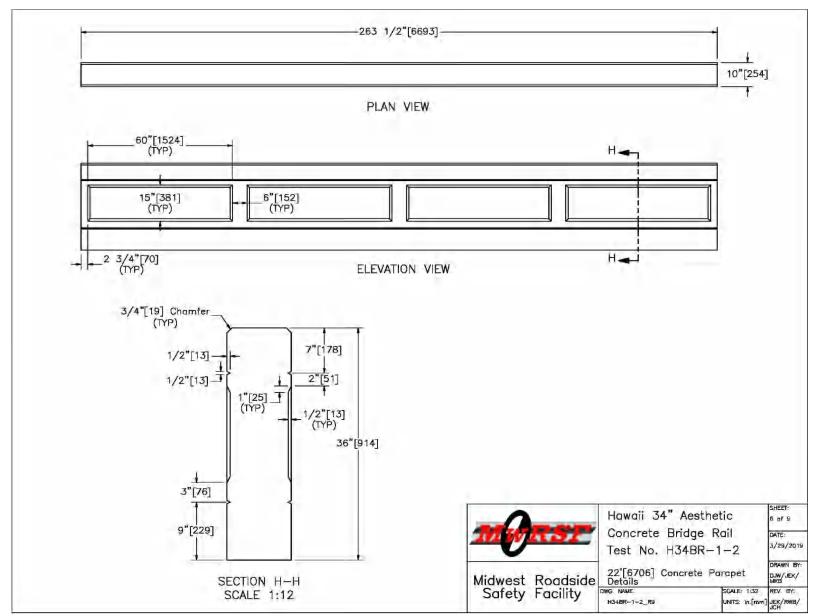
22-ft Concrete Parapet Details, Test Nos. H34BR-1 and H34BR-2
